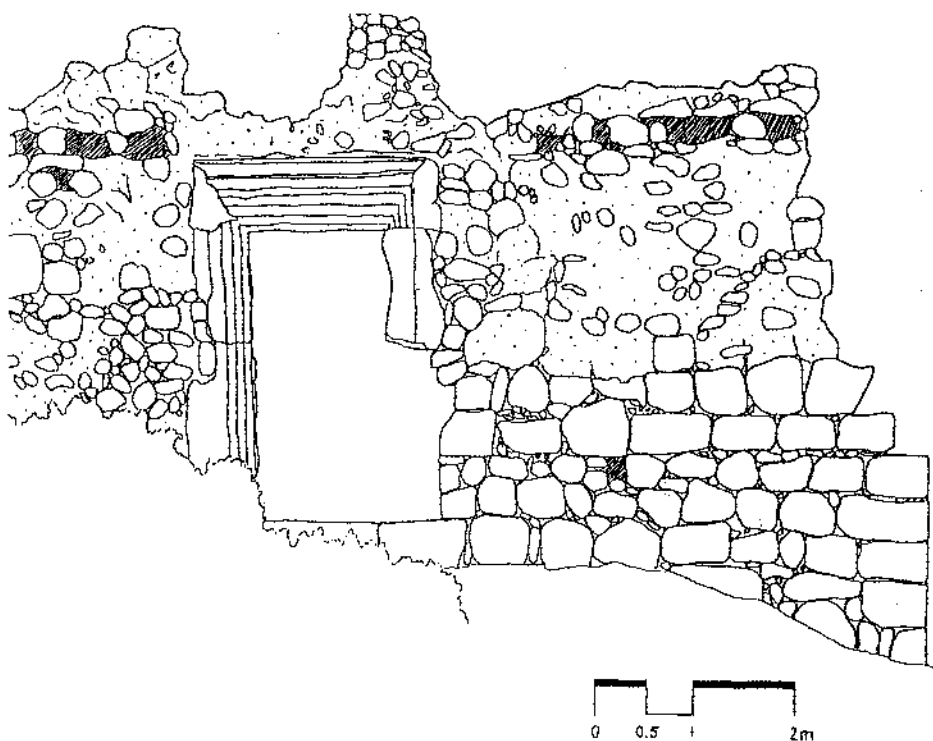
Elevational drawing of same section of west wall (Hill)
